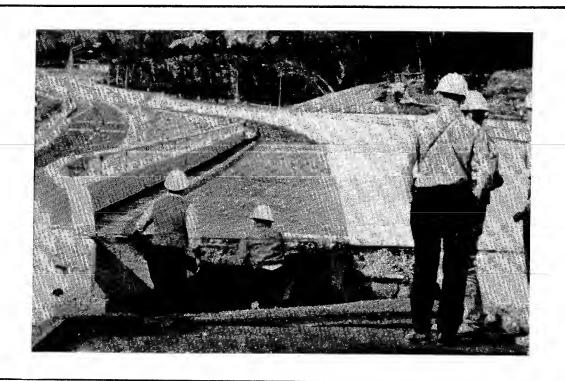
Differential settlement of backfill at abutment Roxford Street Undercrossing at Foothill Boulevard
